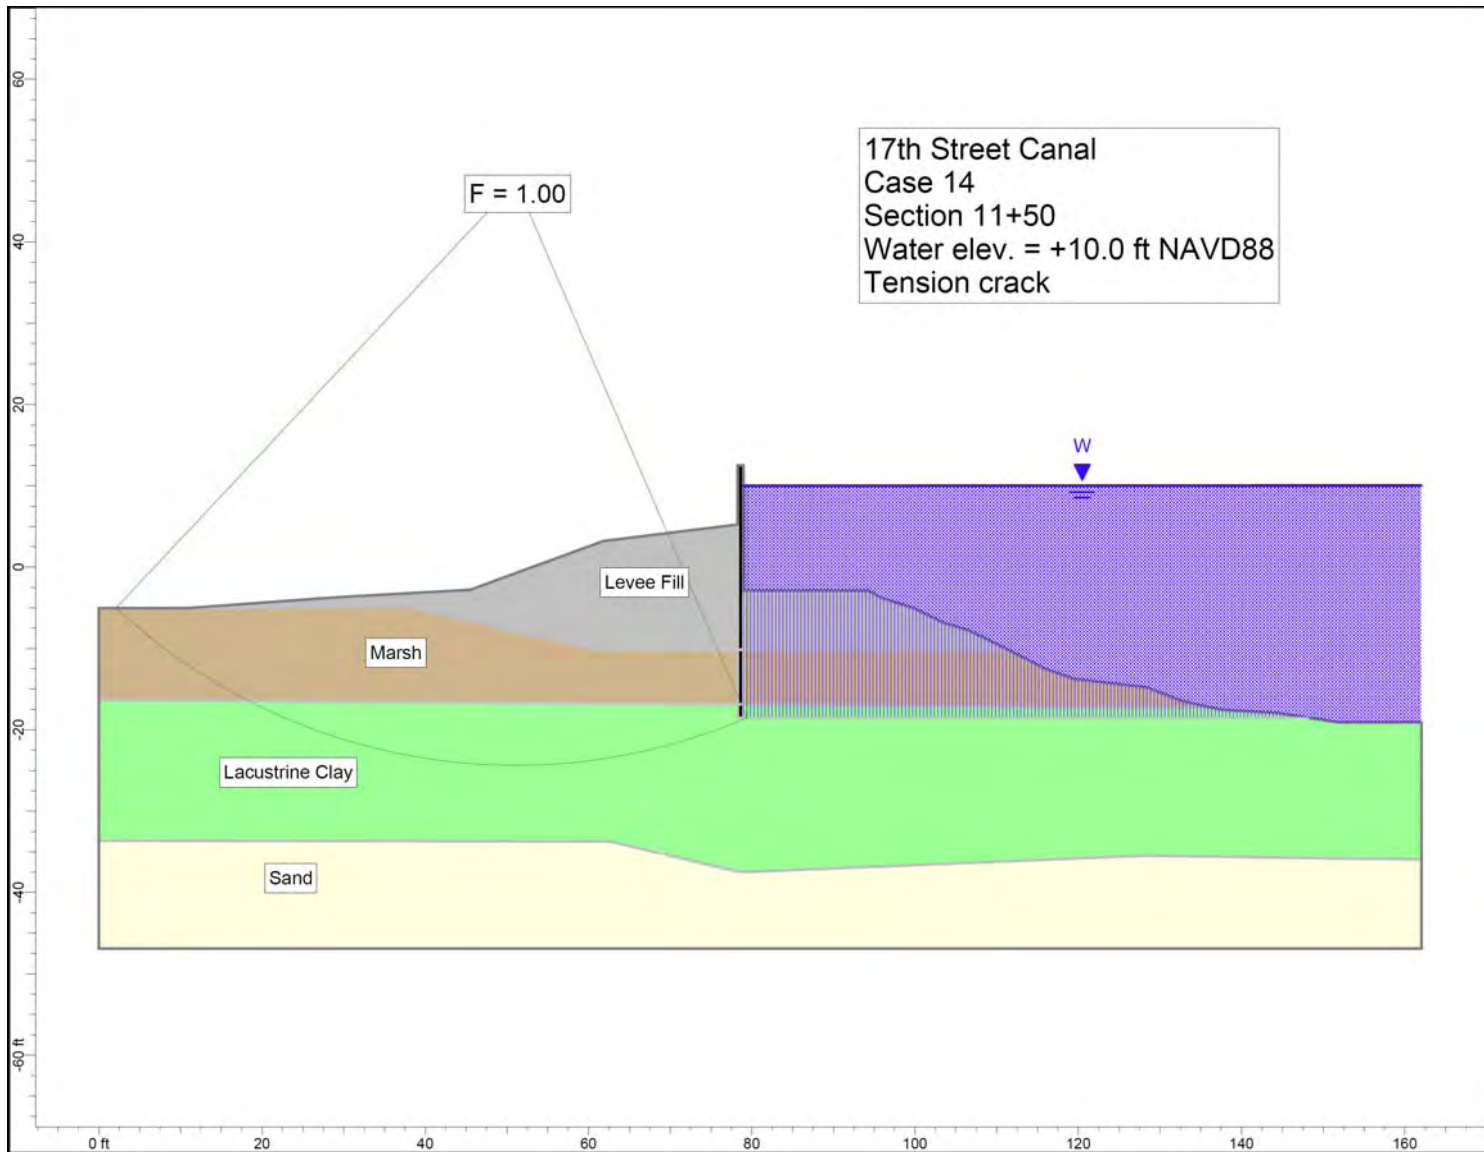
Critical Circle for 17th Street Canal Station 11+50 – Water Elevation 10 ft, Tension Crack
